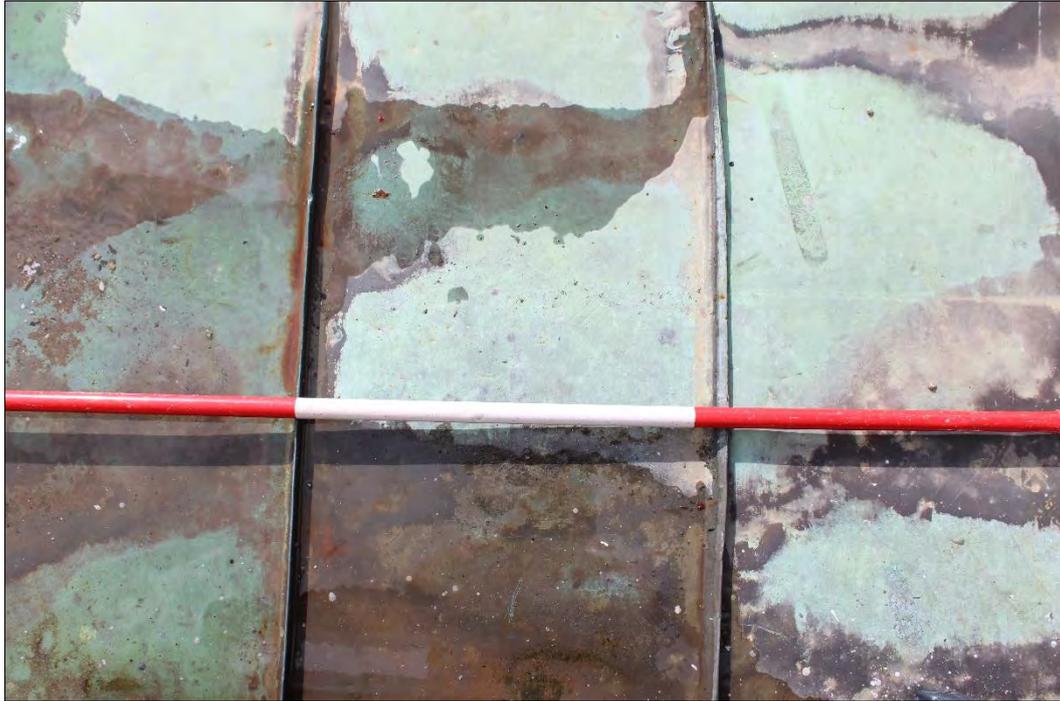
Copper sheeting used for the roof covering. Scale in 0.5m divisions
